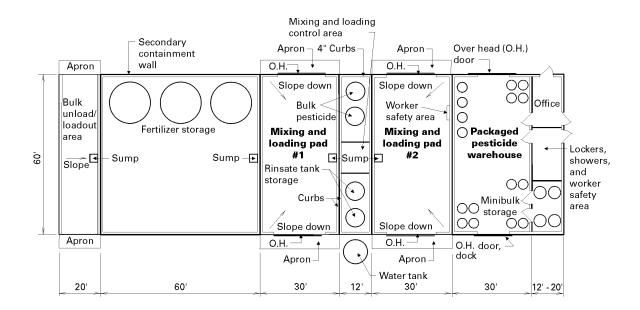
Large-scale facility, plan view. Optional roof over entire facility except fertilizer secondary containment and bulk unload pad.
